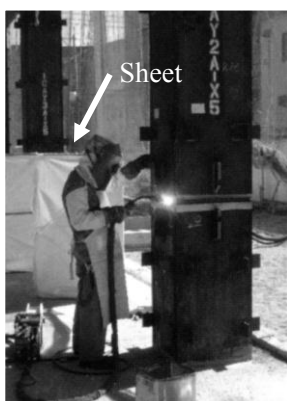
Wind shield sheets and parts for welding in the on-site building construction
